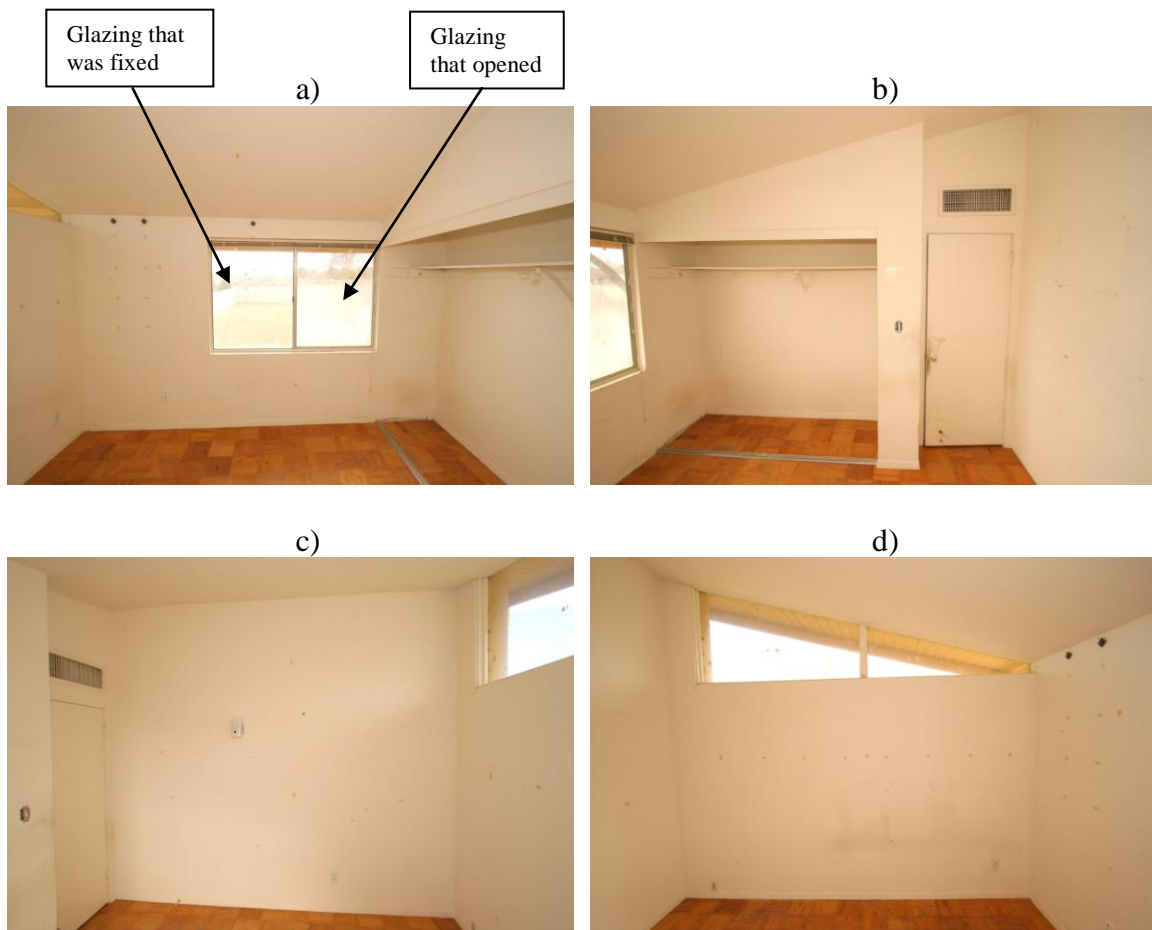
Photographs of the walls of the back bedroom; a) east wall, b) south wall, c) west wall, and d) north wall. See Appendix A for larger photographs and detailed drawings of this room.
